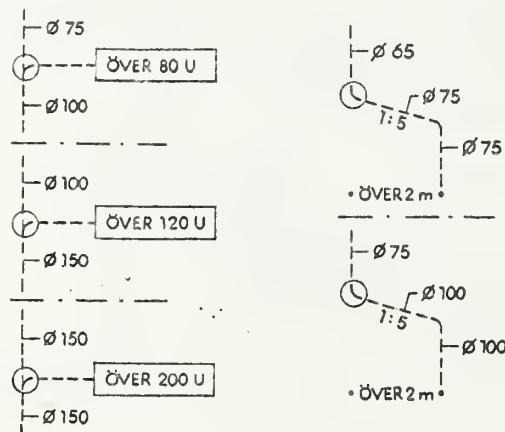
A plan for single stack drainage in 20-story apartment building--
